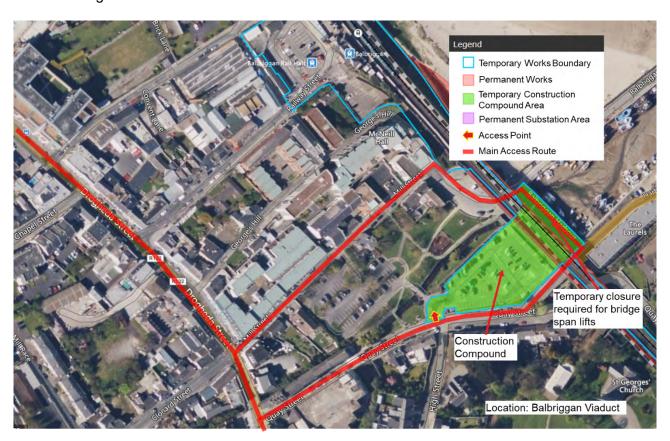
UBB56 Balbriggan Viaduct Construction Compound and Access Route
